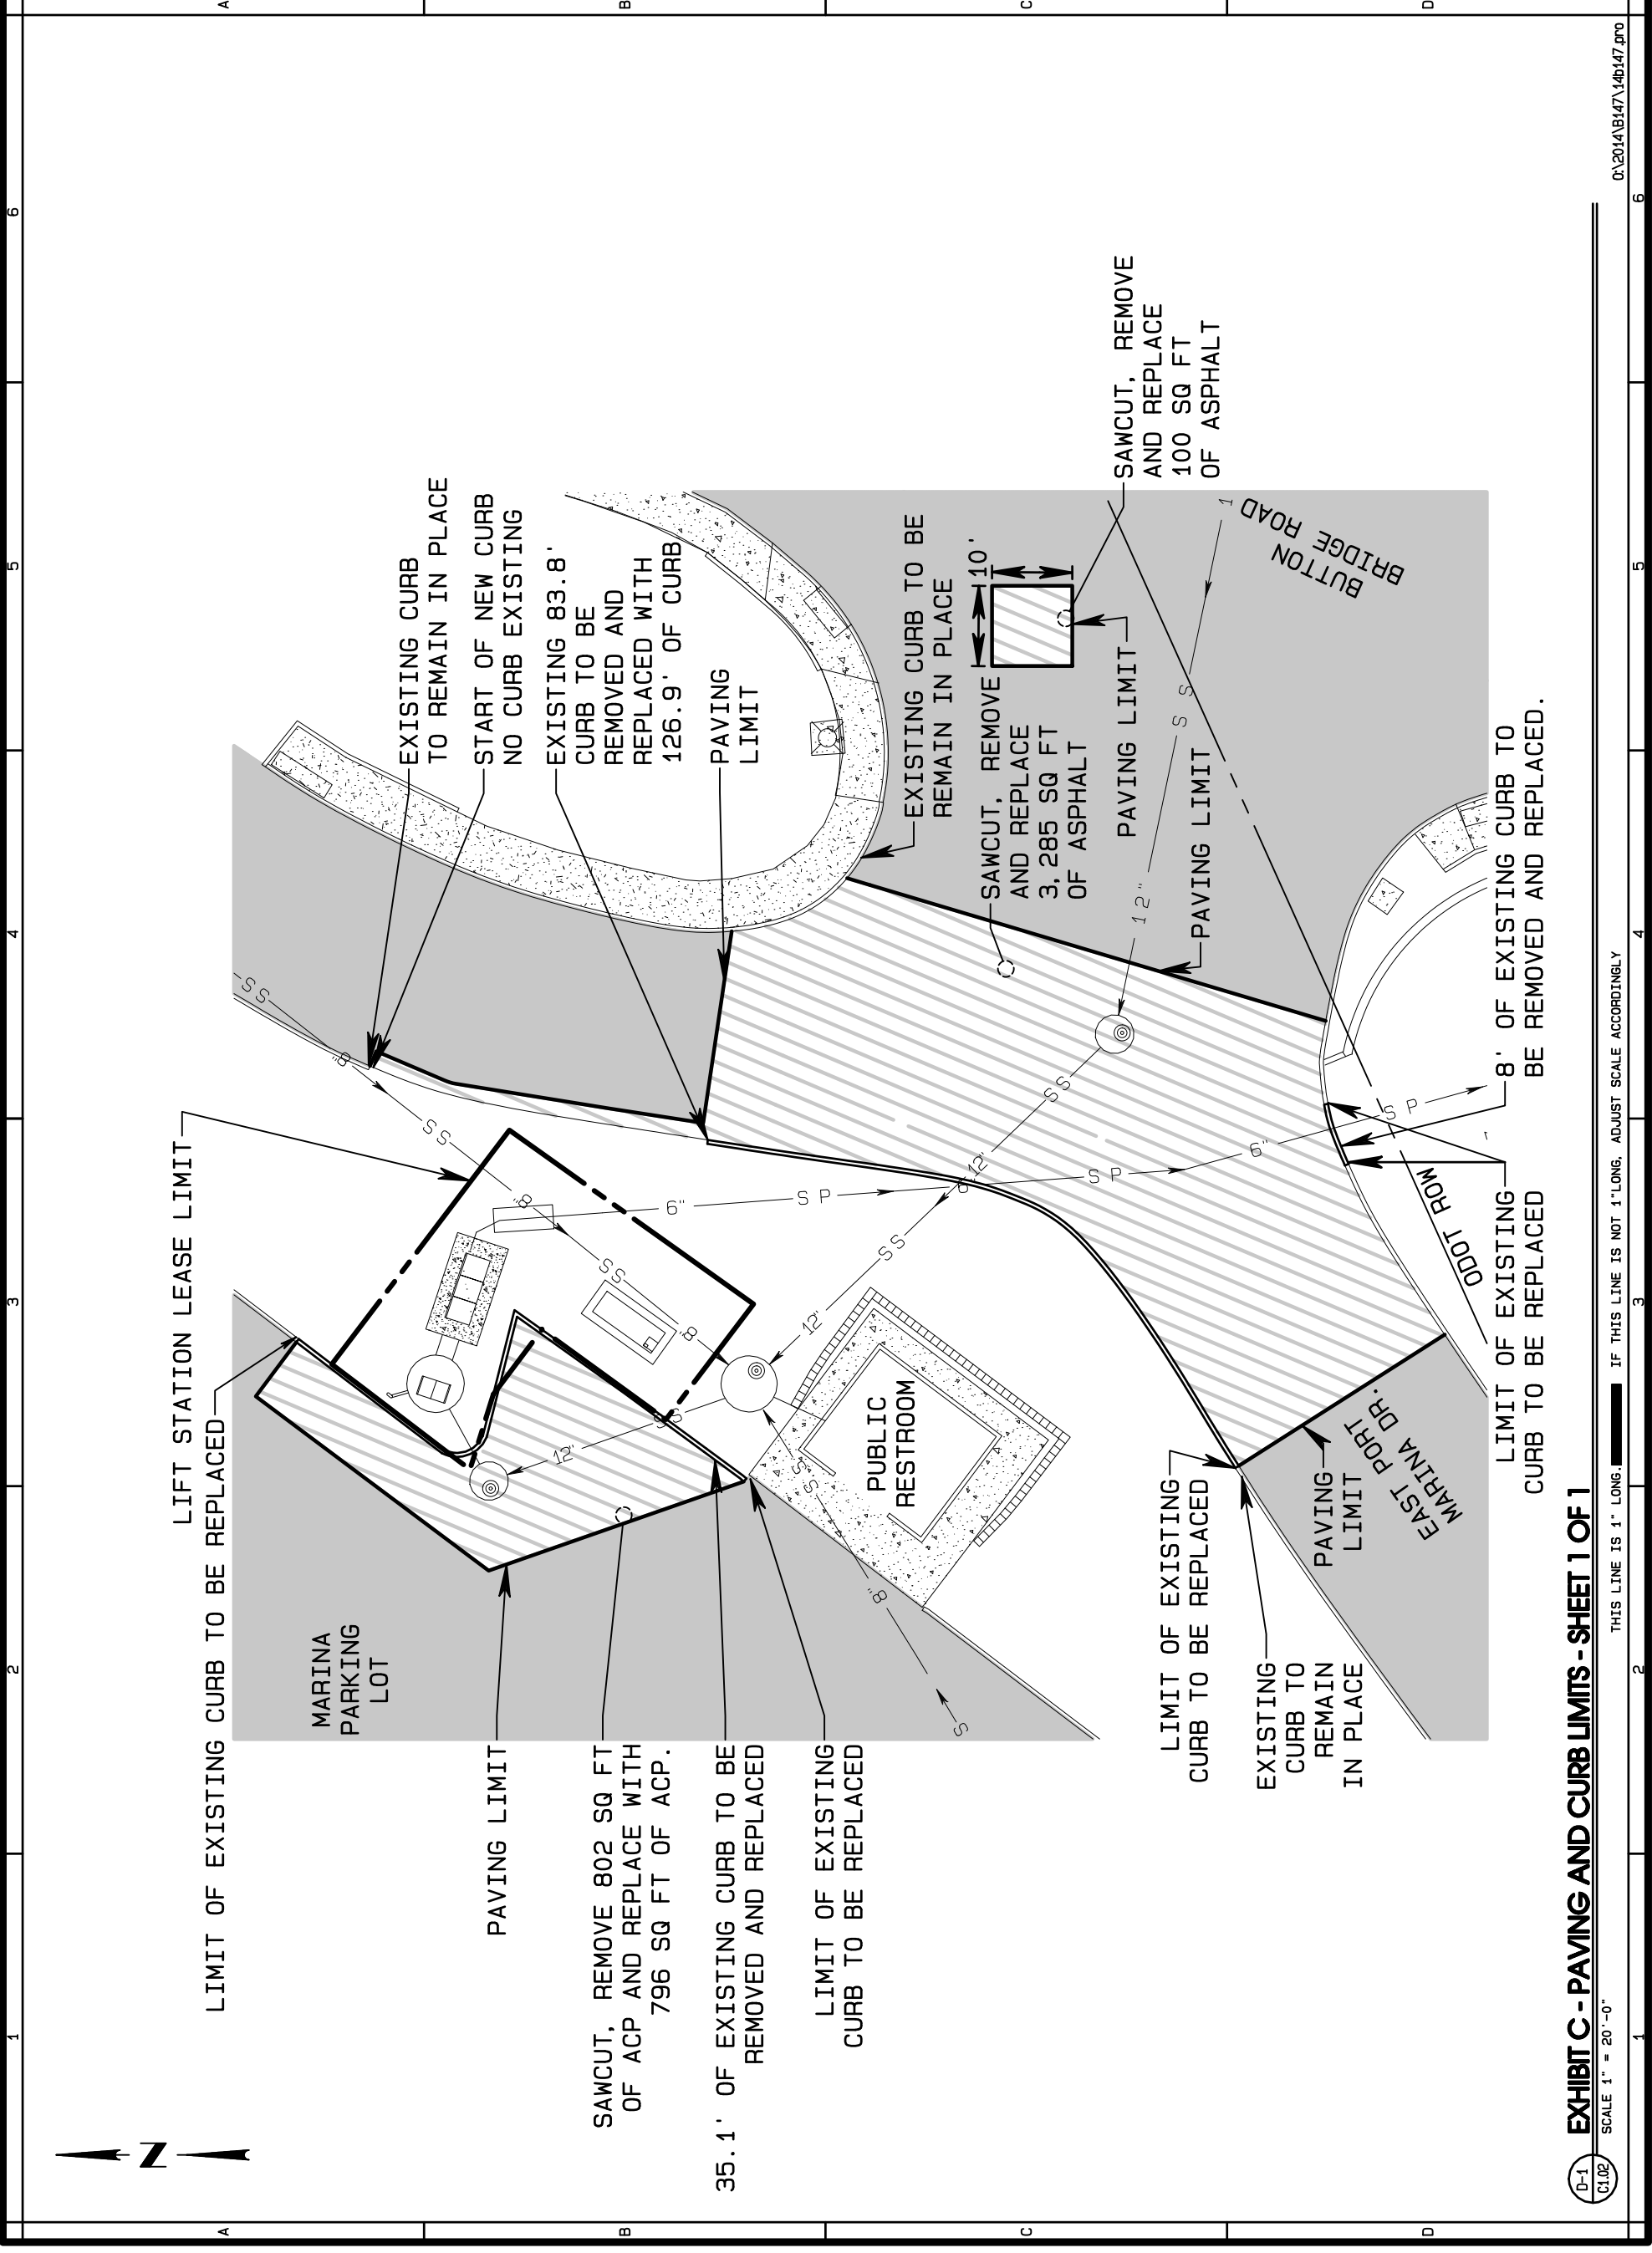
EXHIBIT C - PAVING AND CURB LIMITS - SHEET 1 OF 1
